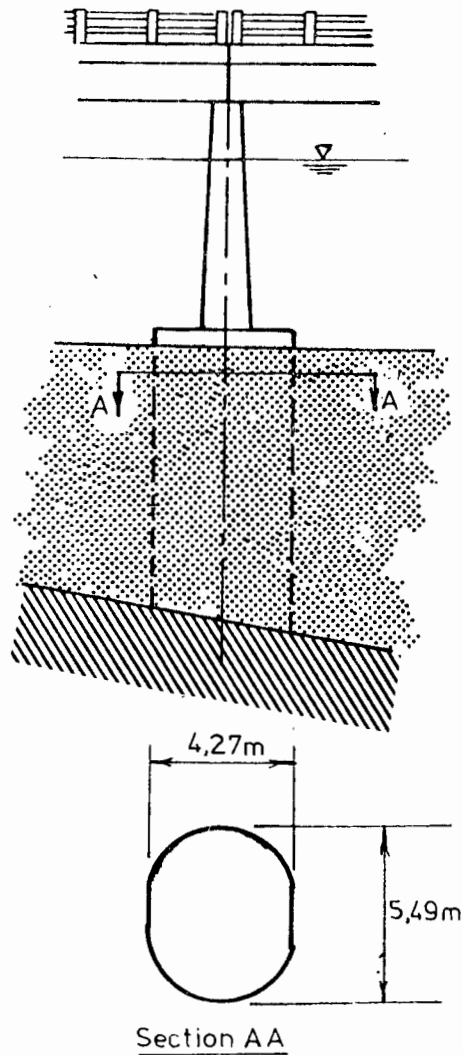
Boy Retief Bridge - Pier & Foundation Details
